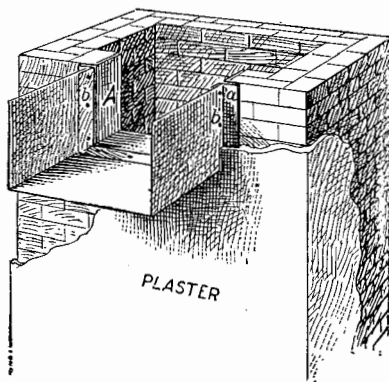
Sectional View Showing Sheet Metal Ceiling Duct, Connected Airtight to Vertical Brick Flue
